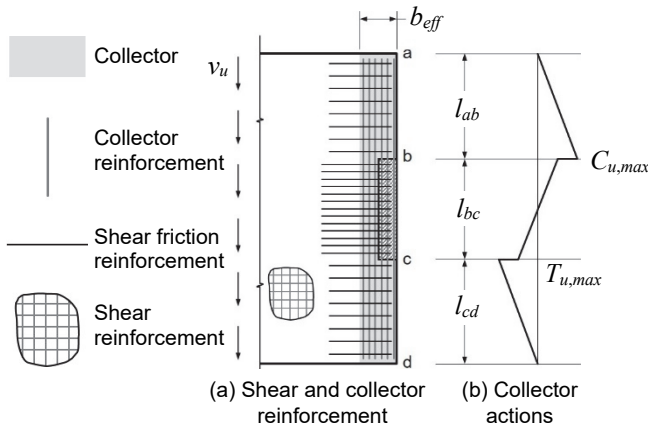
Shear reinforcement, collector reinforcement, and shear-friction reinforcement.
